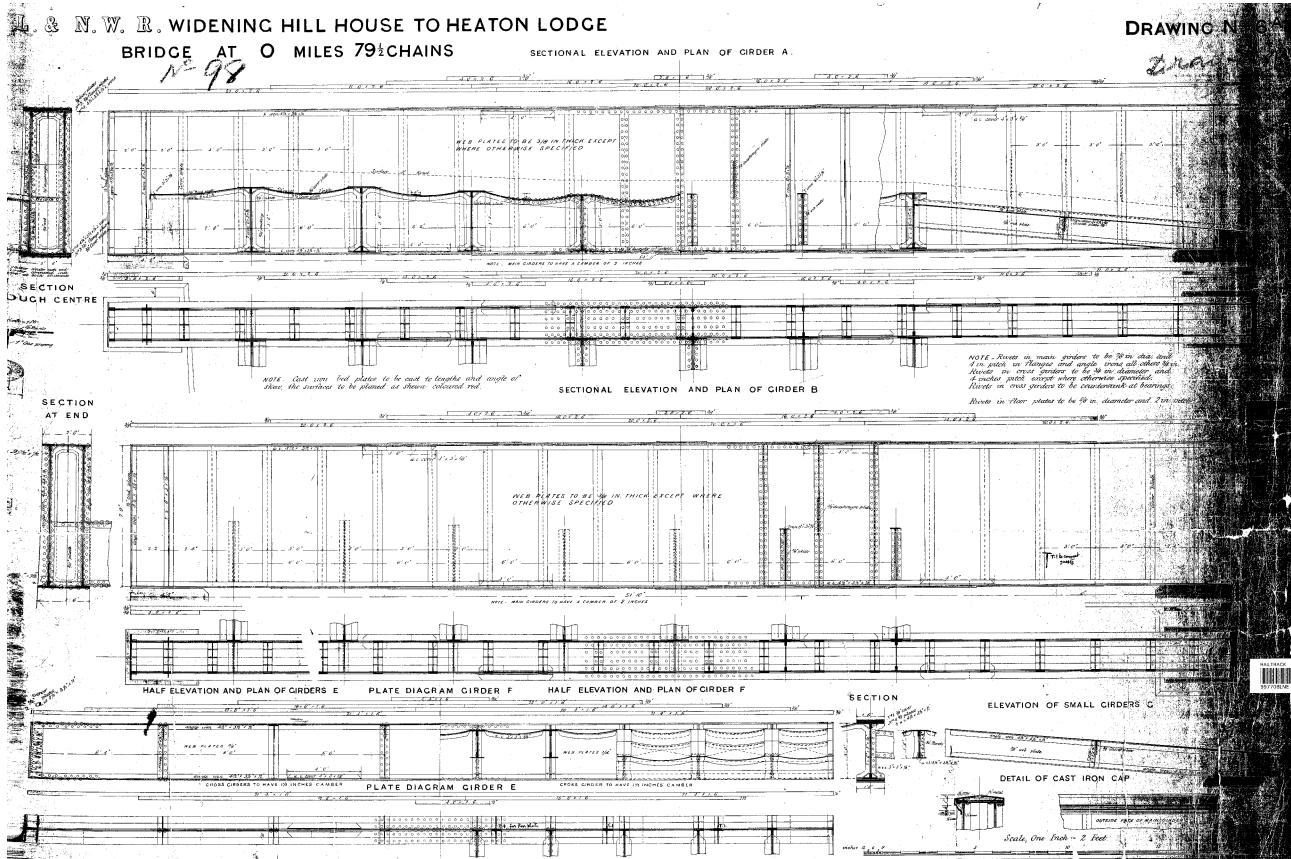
LNWR Drawings of Fieldhouse Overbridge (MVL3/98), 1882. (Network Rail NRG Archive 997708LNE).
